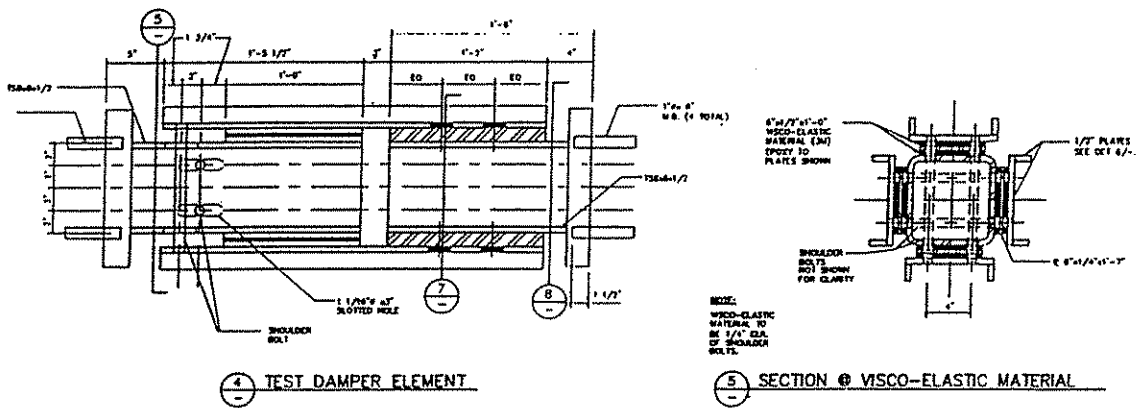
VE-dampers used for Santa Clara Courthouse retrofit [Blondet, 1993].
